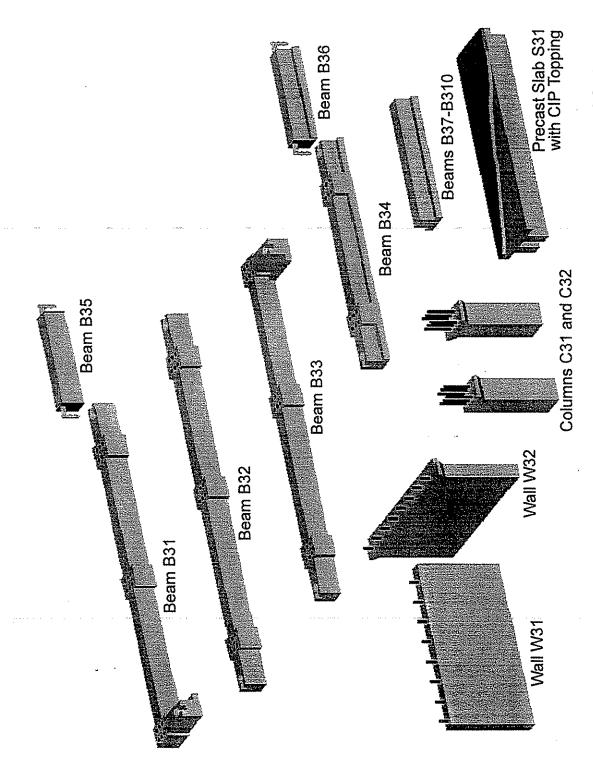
Typical Shapes of Precast Members for the Demonstration Structure Using 3D-APC System
